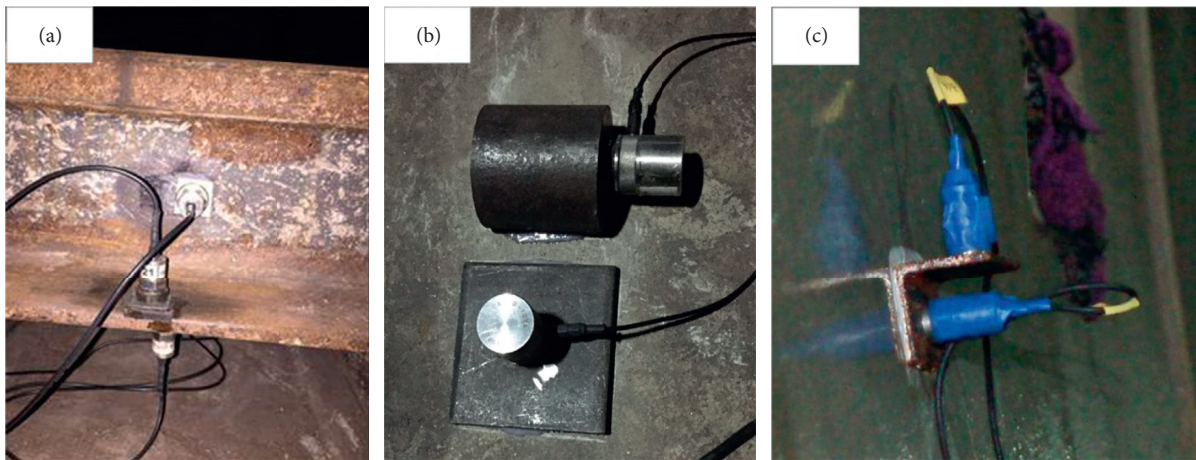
Accelerometers installed on the (a) rail, (b) track bed, and (c) tunnel wall.
